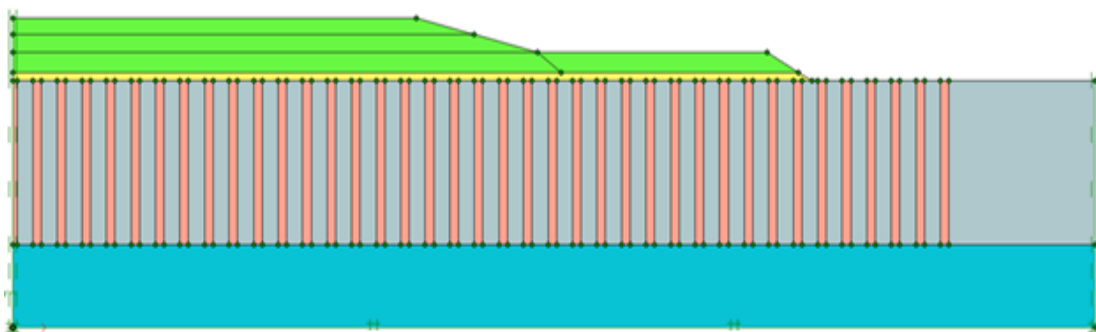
A typical picture of DSM columns installation modeled in PLAXIS-2D software
